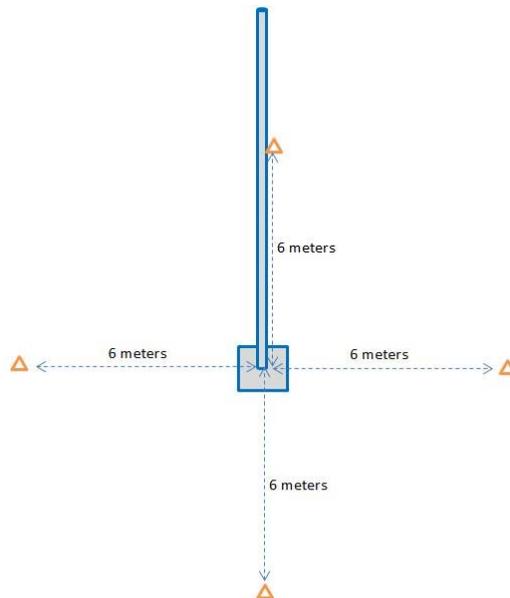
Tower assembly layout on the ground. Triangles represent anchors. North is up.
